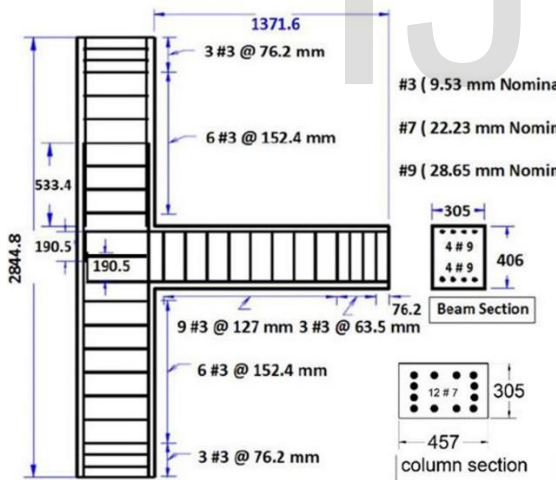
Specimen dimensions and details of Exterior beam-column connection
